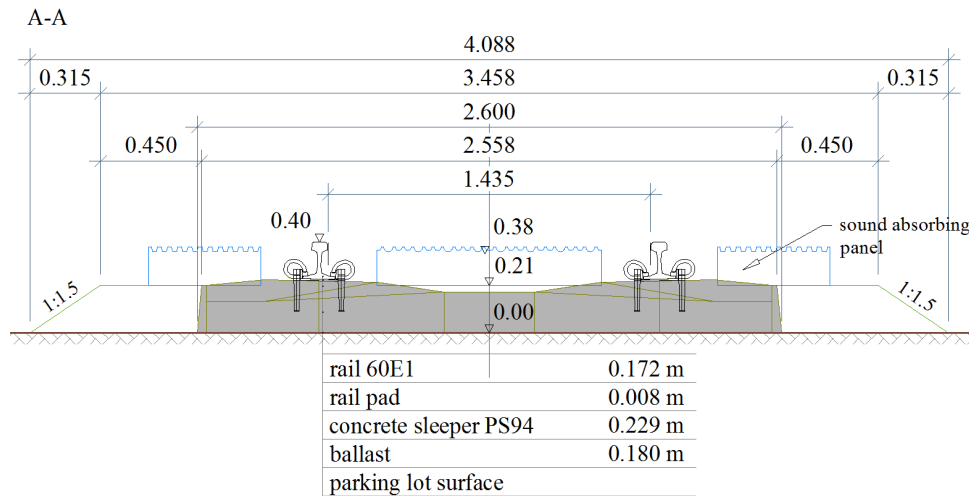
Cross-section of the ballasted track structure with sound absorbing panels.
